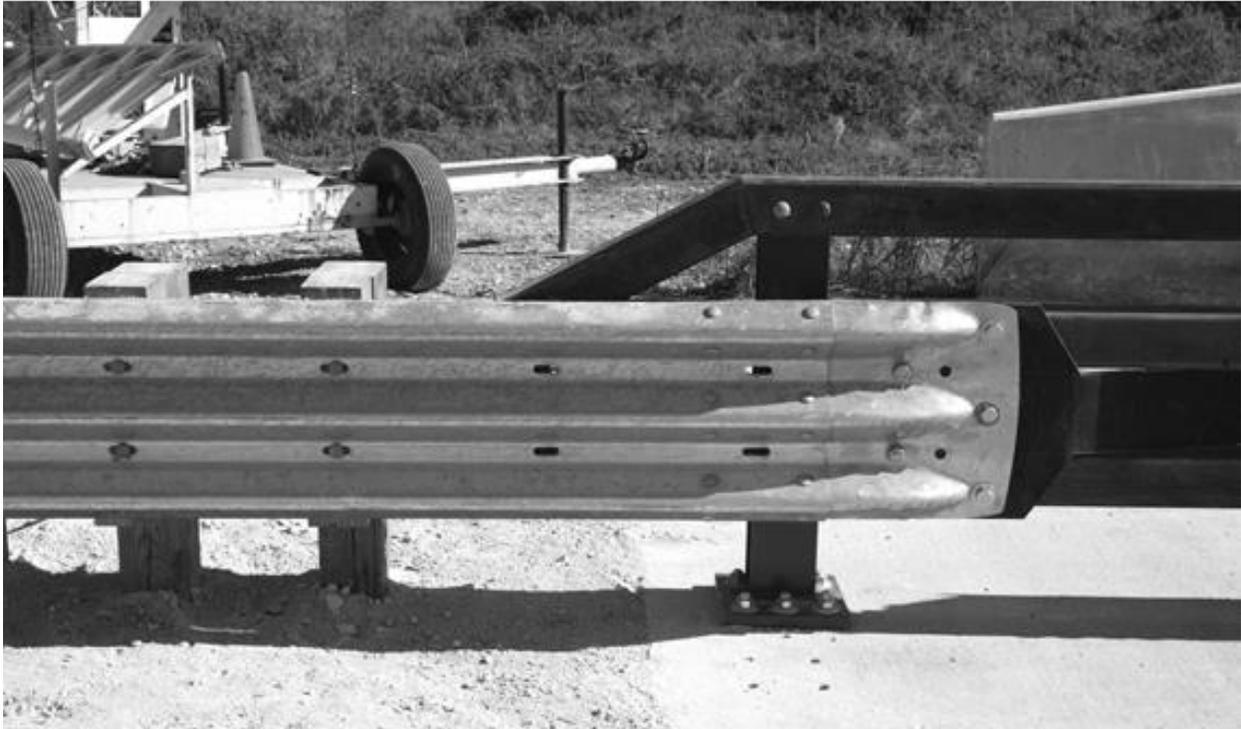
Thrie Beam Transition to Wisconsin Type M Tubular Steel Bridge Rail [24]
